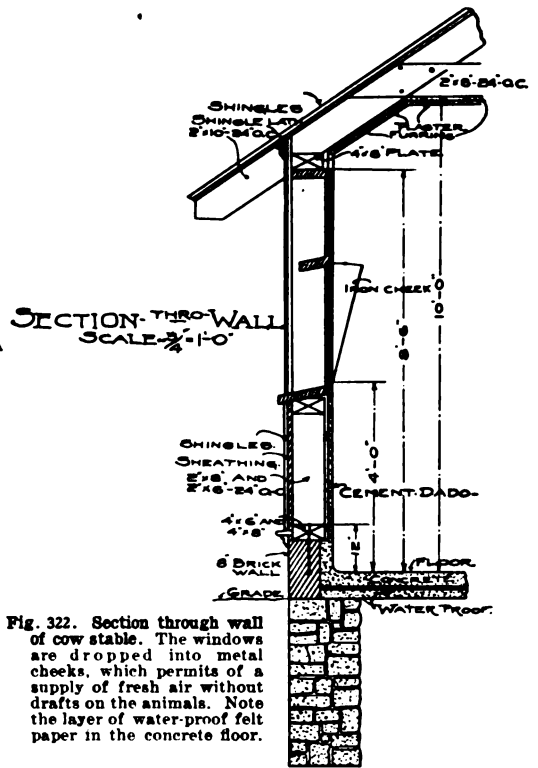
Section through wall of cow stable. The windows are dropped into metal cheeks, which permits of a supply of fresh air without drafts on the animals. Note the layer of water-proof felt paper in the concrete floor.
